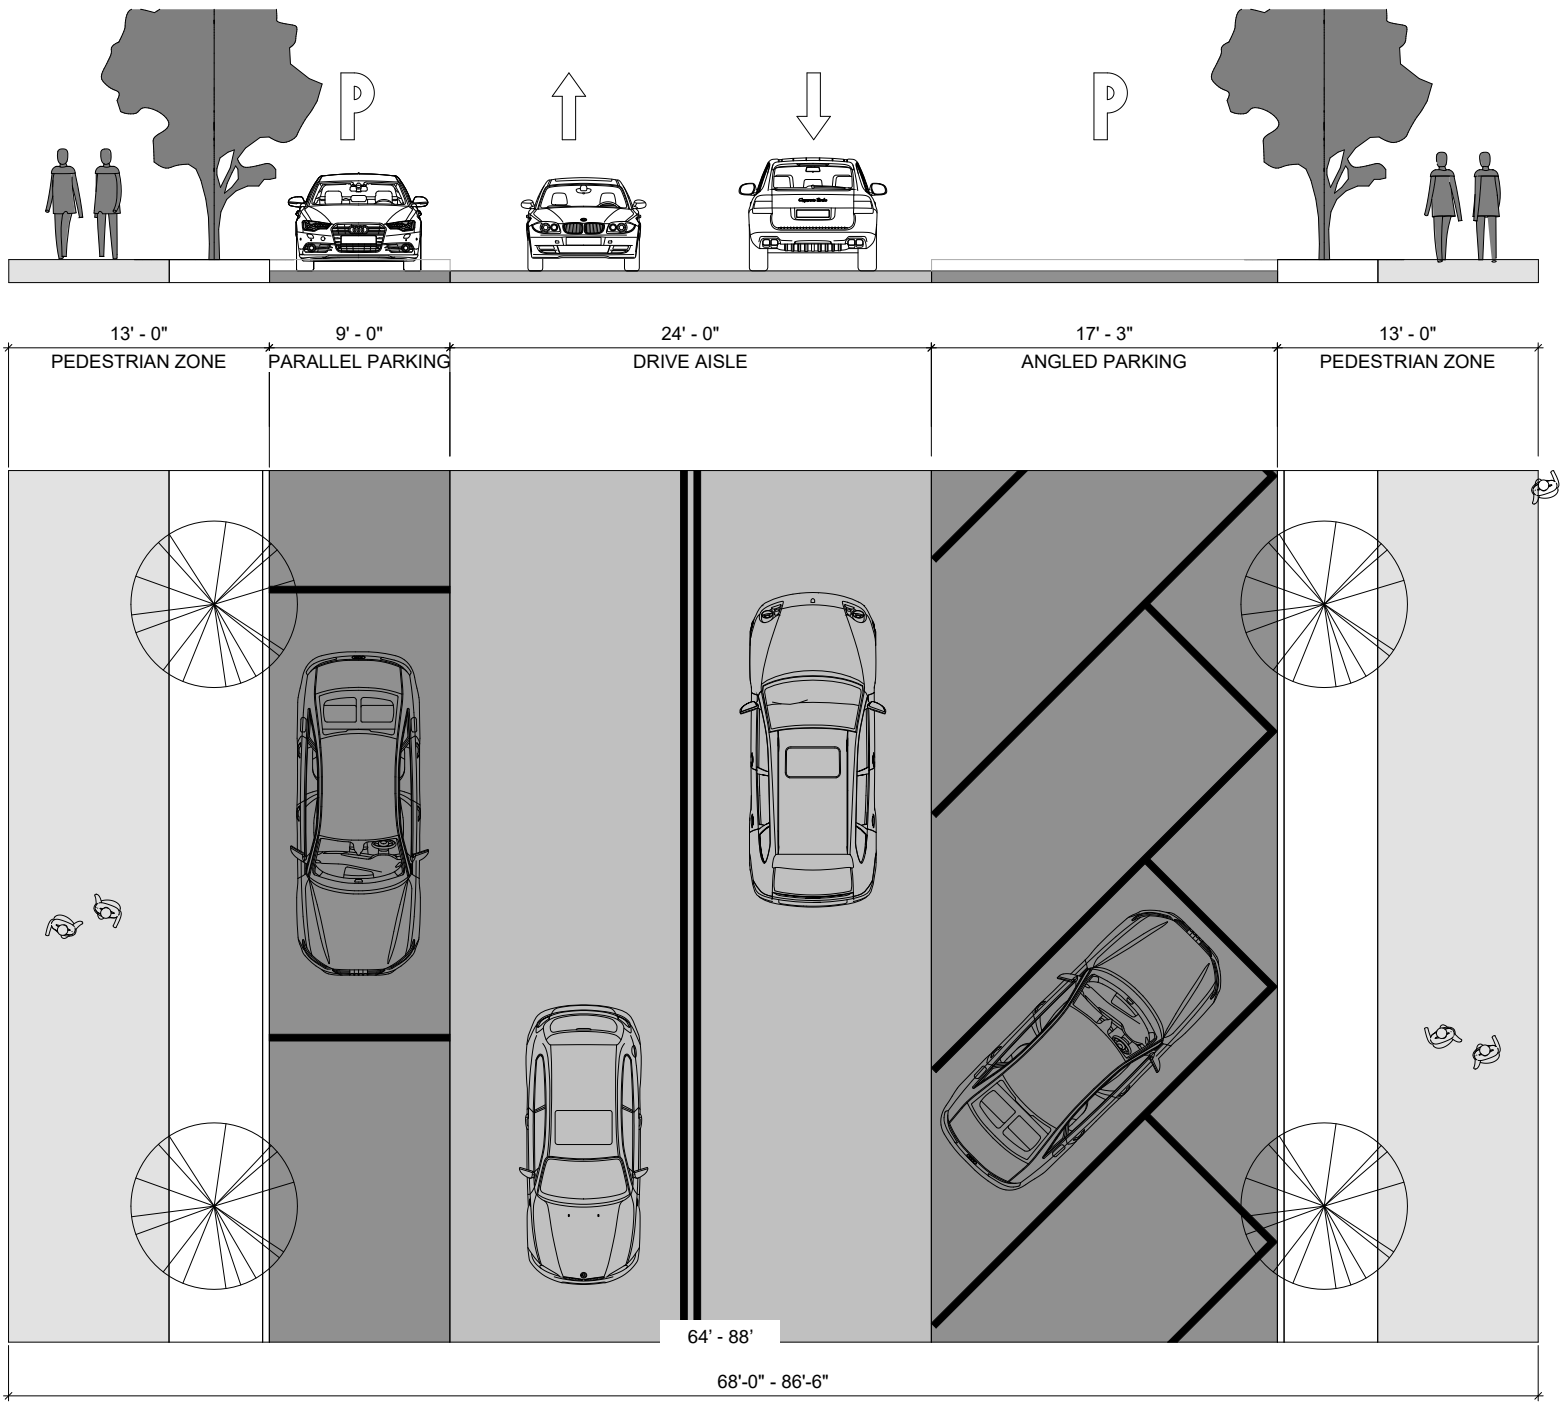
EXHIBIT F STREET CROSS SECTION - WEST OAK AVENUE
